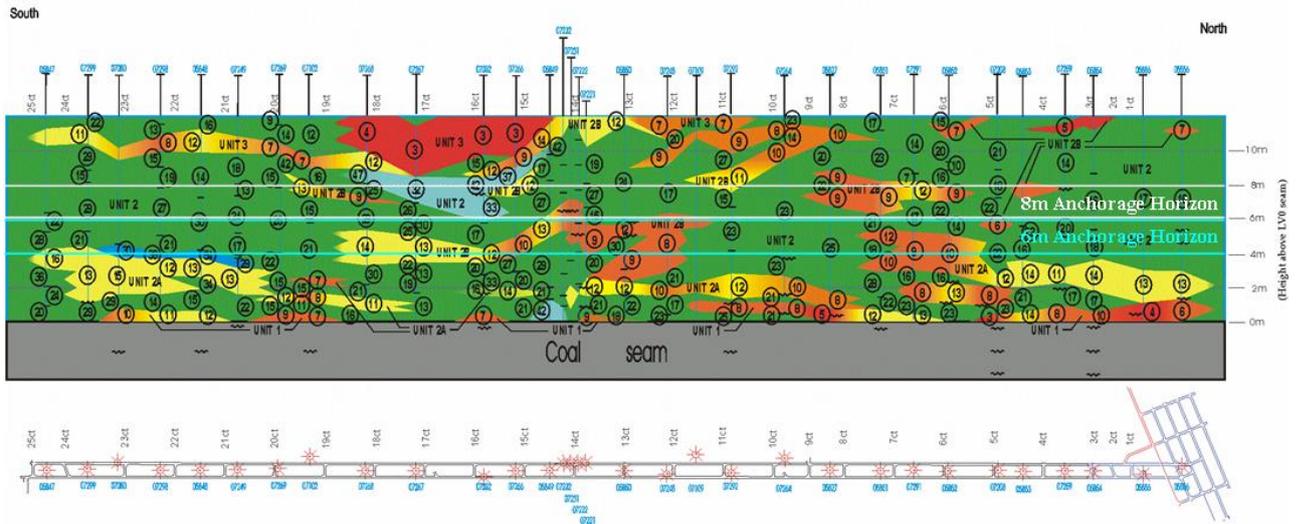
Selecting cable bolt lengths based on effective anchorage horizon
